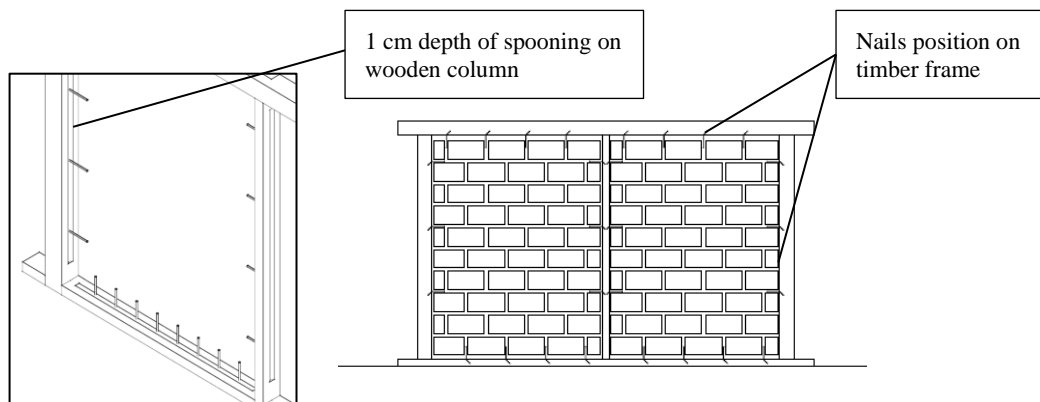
(a) The spooning on timber frame. (b) The nail position on the timber frame
